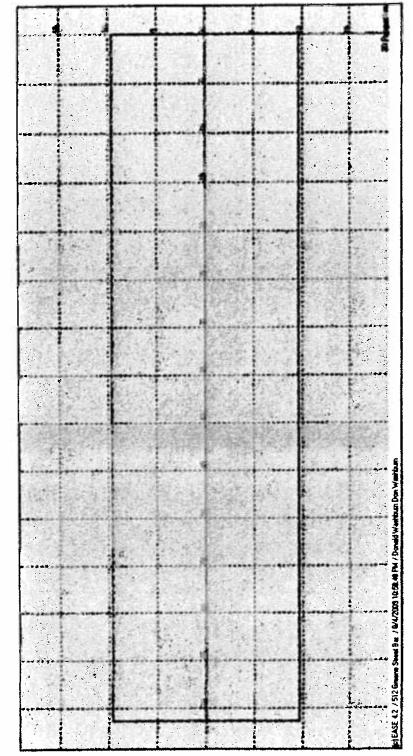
Plan view of Greene Street Bar as rendered in EASE 4.2
